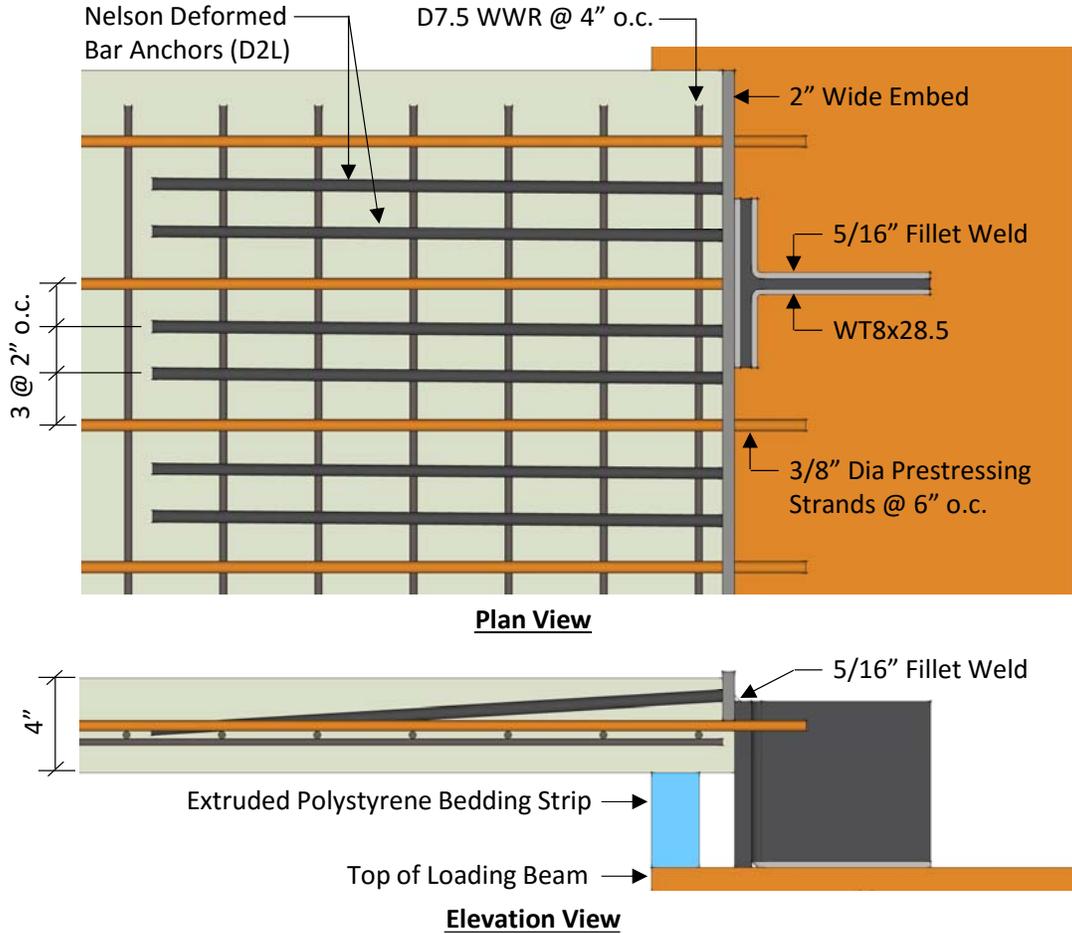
Plan and Elevation Views of the Embed-Anchor Detail
